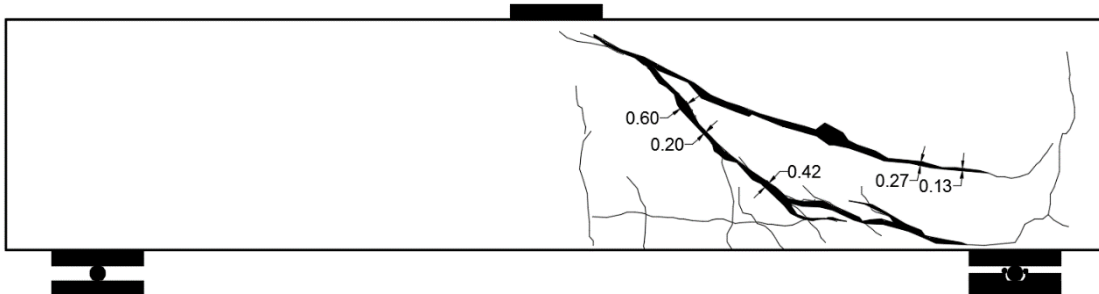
Crack pattern at failure for SNFRC 0.5% beam #22
